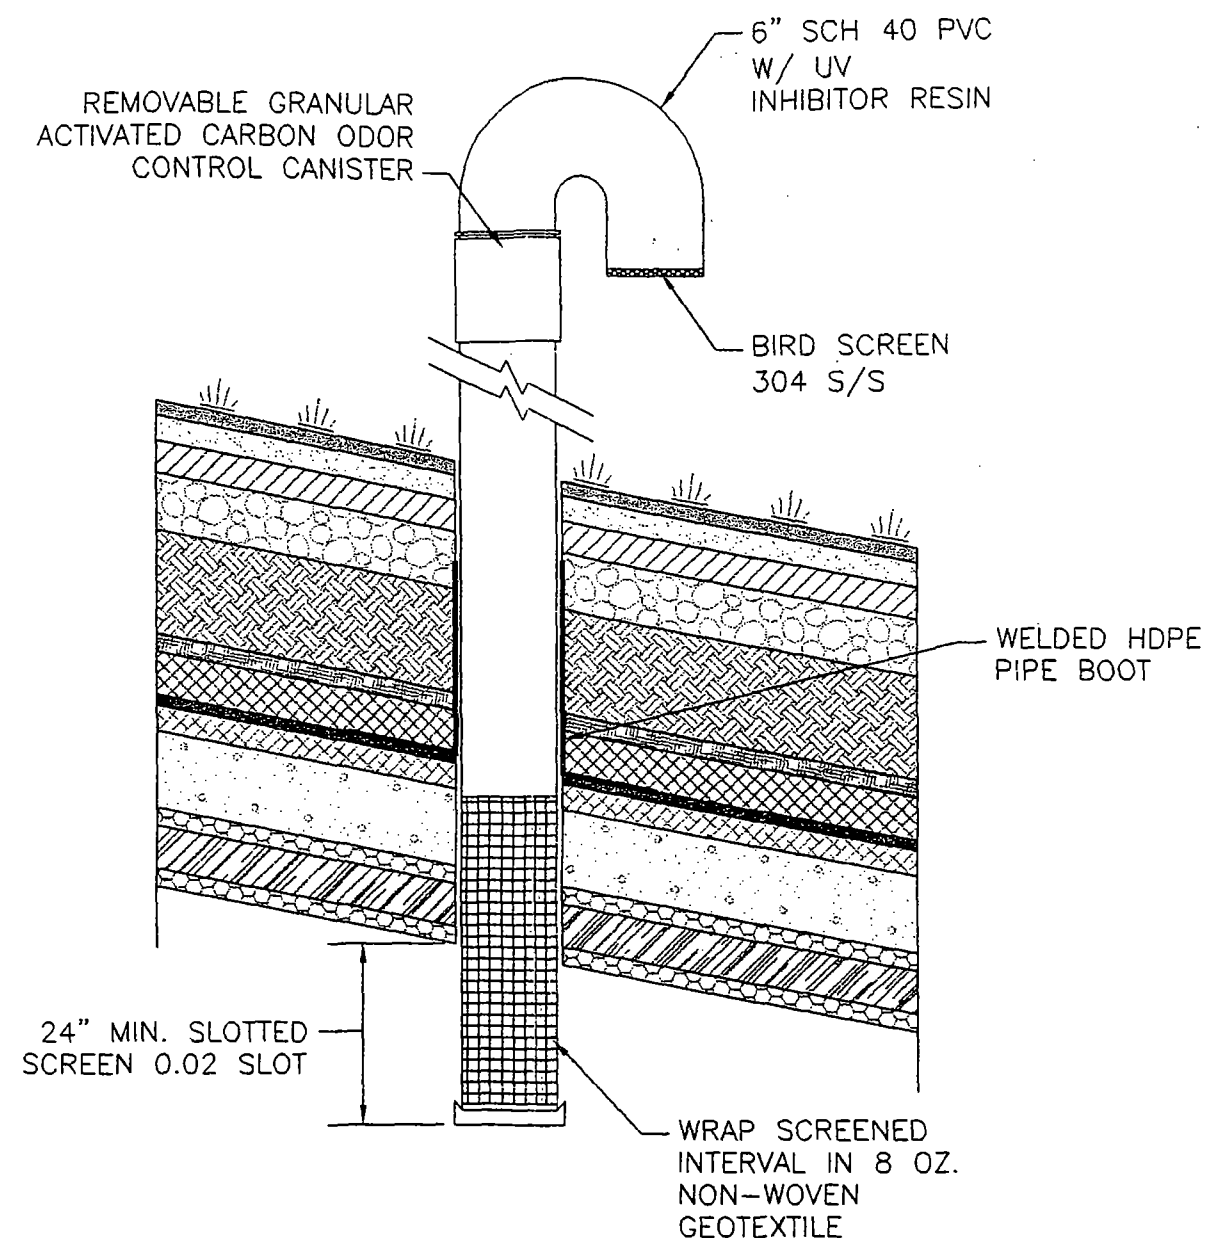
Fill Area Alternatives C, D, E, and F - Cover Details, Site I, Sauget Area 1
